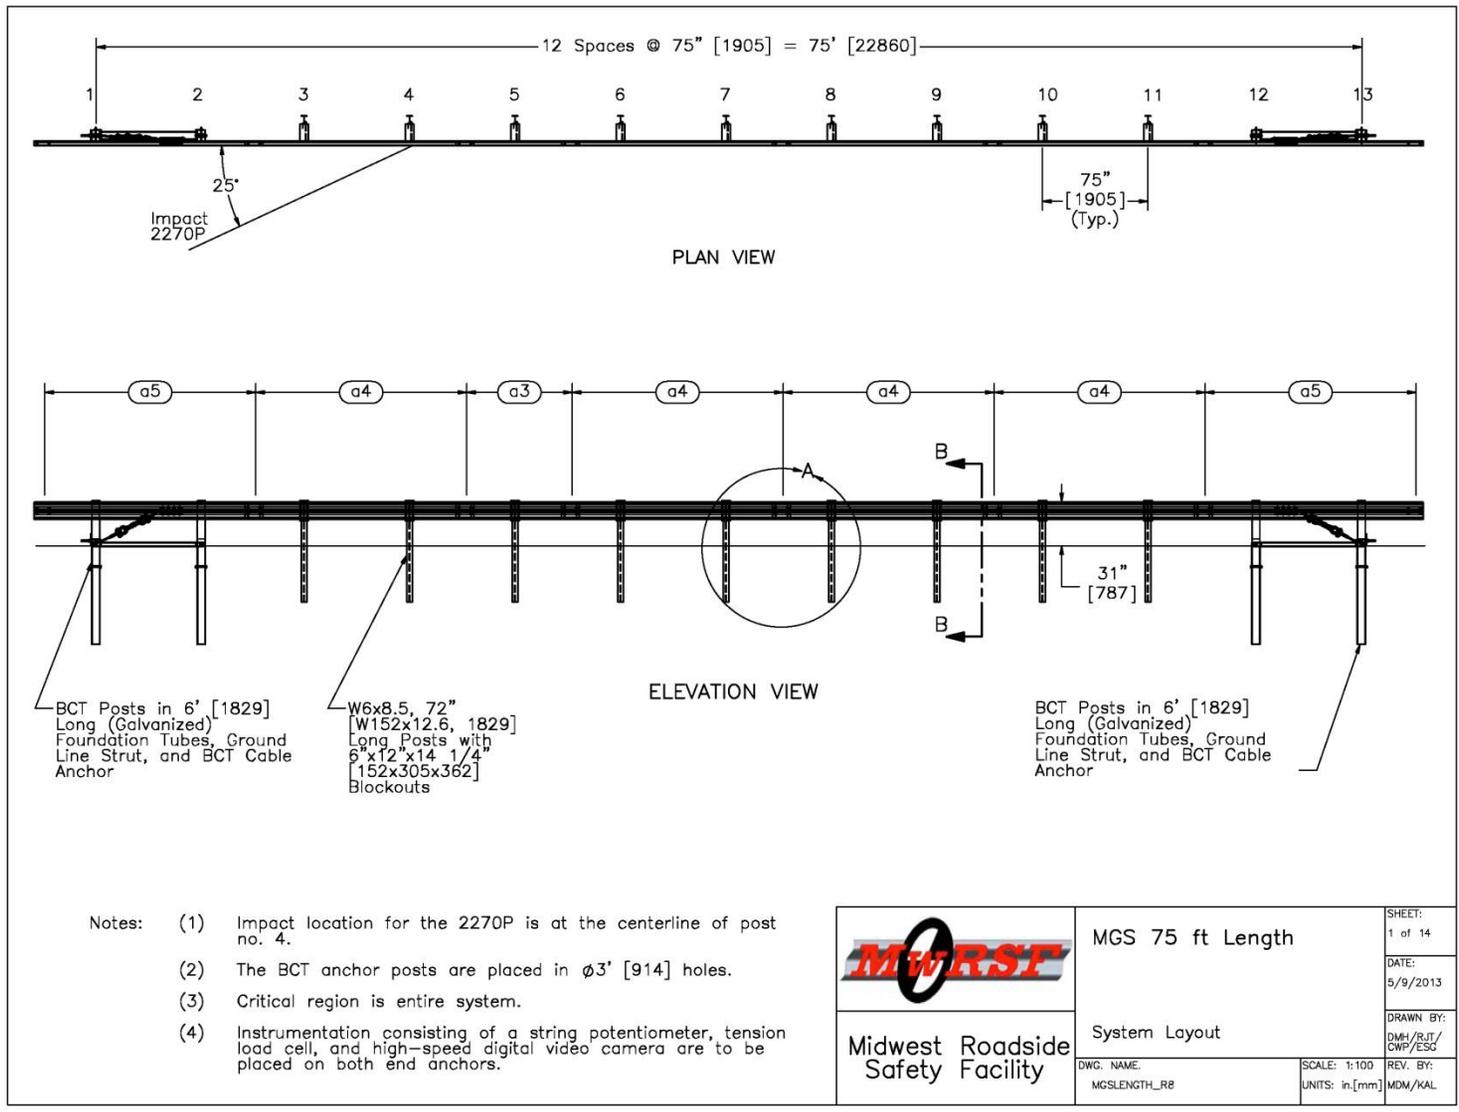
Test Installation Layout, Test No. MGSMIN-1
